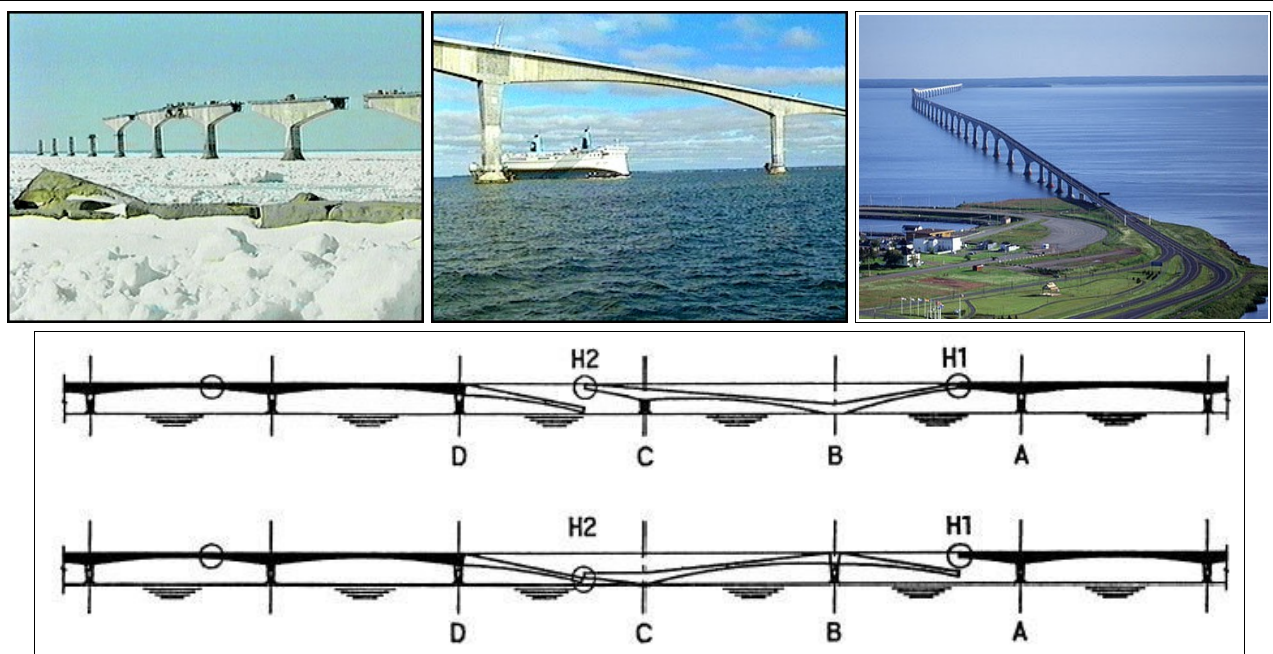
The Confederation Bridge in Prince Edward Island, Canada, is a post-tensioned prestressed concrete bridge composed of 43 spans, each 250m long. It was inaugurated in 1997. It was designed with structural “fuses”, to allow the maximum Collapse of two and a half spans in case of one structural element failure. The idea to apply complementation arose by observing that in 1992 a similar bridge in Seoul, Korea suffered a Progressive Collapse in which the prestressing cables ripped the concrete decks for a total of eleven spans. (Sources: [www.confederationbridge.com](http://www.confederationbridge.com); [46]).
